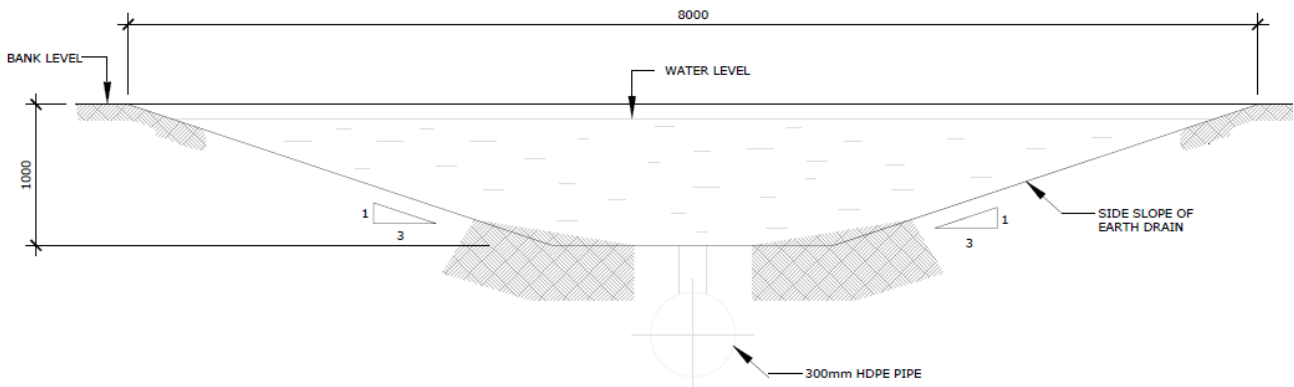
Typical section through earth swale that will be excavated with a 1 to 3 side wall earth slope
